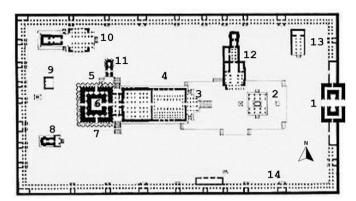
Plan of Brihadeshwara Temple ,Sujatavanigunasagaran, by. (2002). A STUDY ON HINDU TEMPLE PLANNING, CONSTRUCTION AND THE V AASTU A Study on Hindu Temple Planning, Construction and The Vaastu
